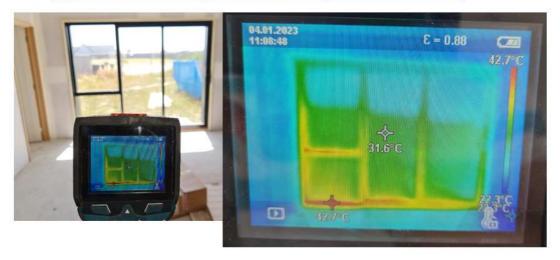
Thermal Image of Door at Dining Room on 4 Jan 2023
